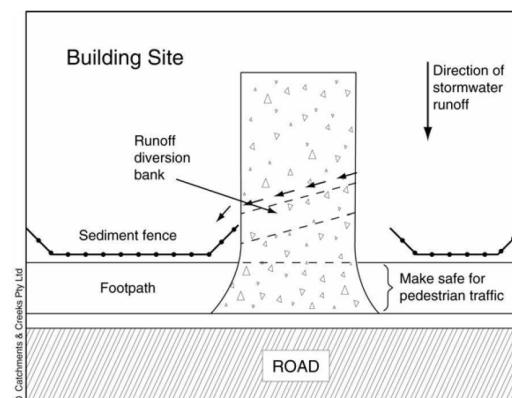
Typical stabilised all-weather site access – PLAN VIEW
